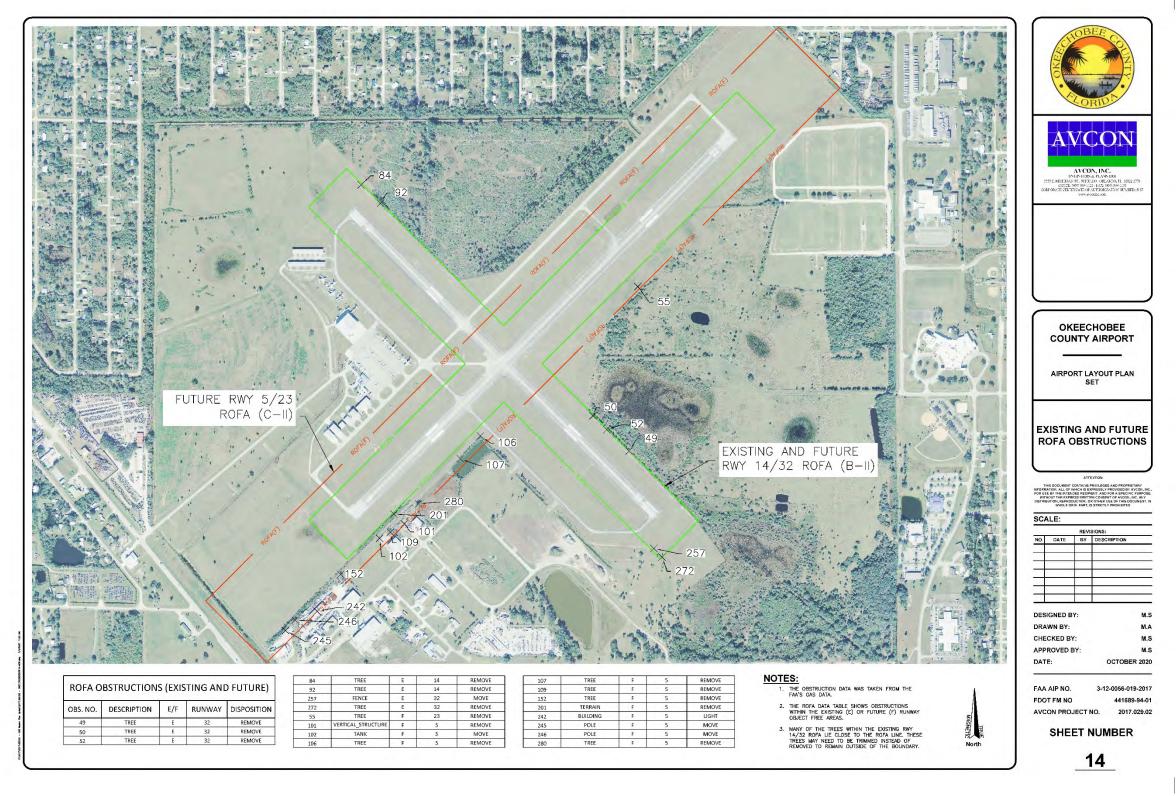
EXISTING AND FUTURE ROFA OBSTRUCTIONS
